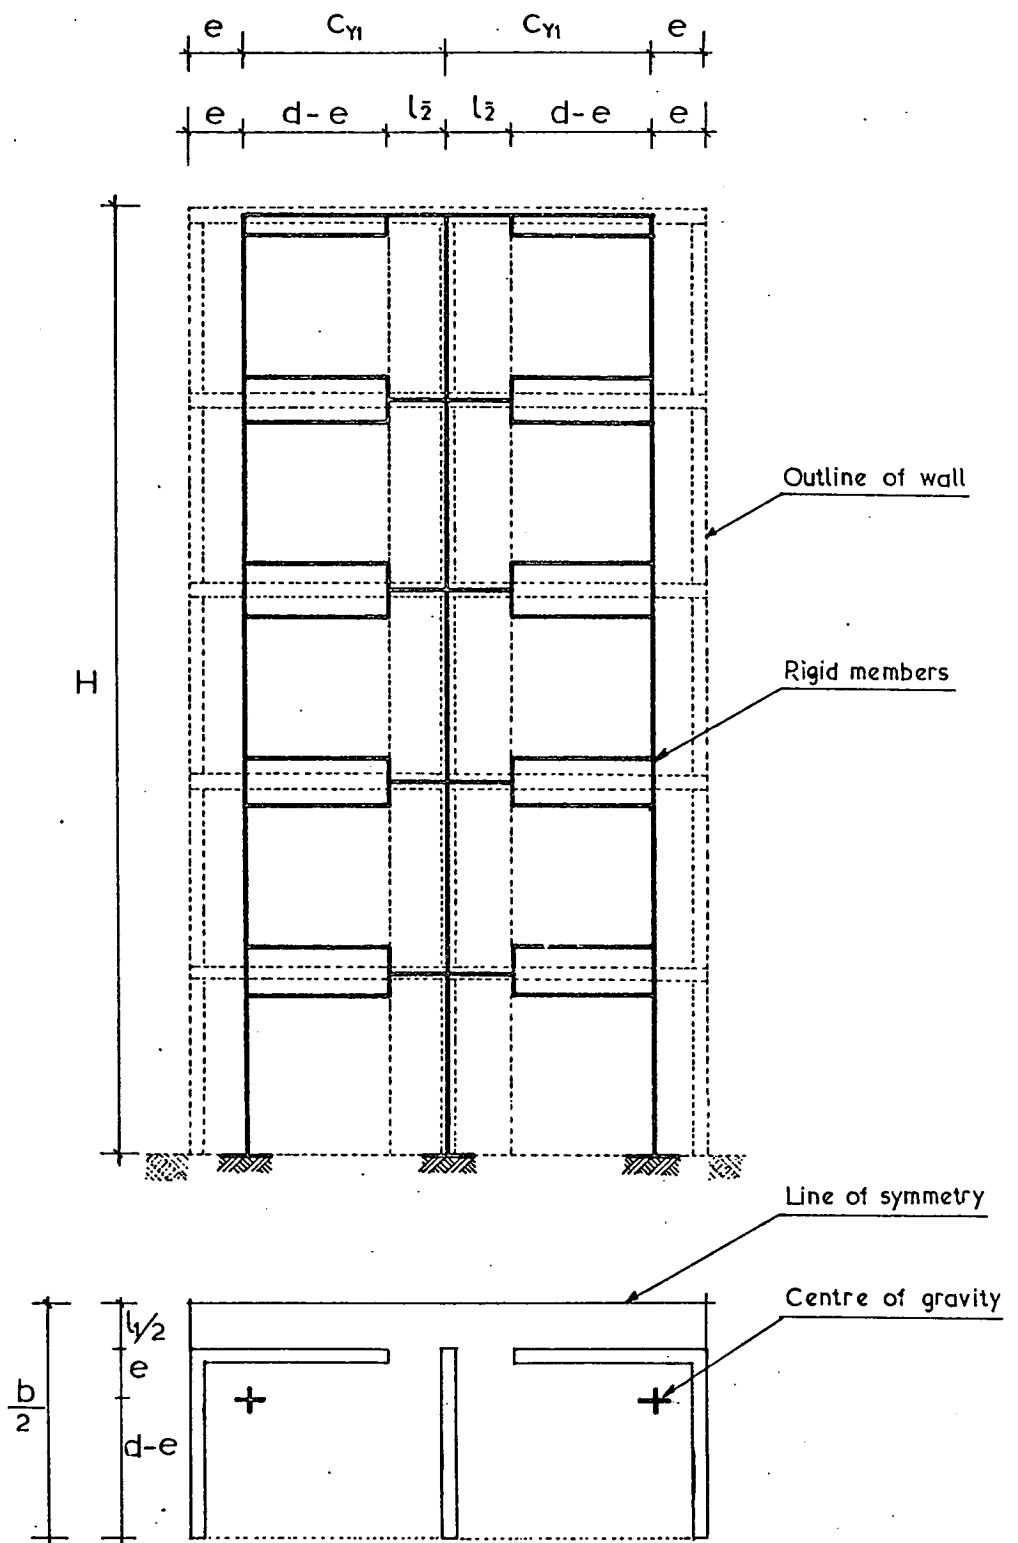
PLAN AND ELEVATION OF BUILDING
